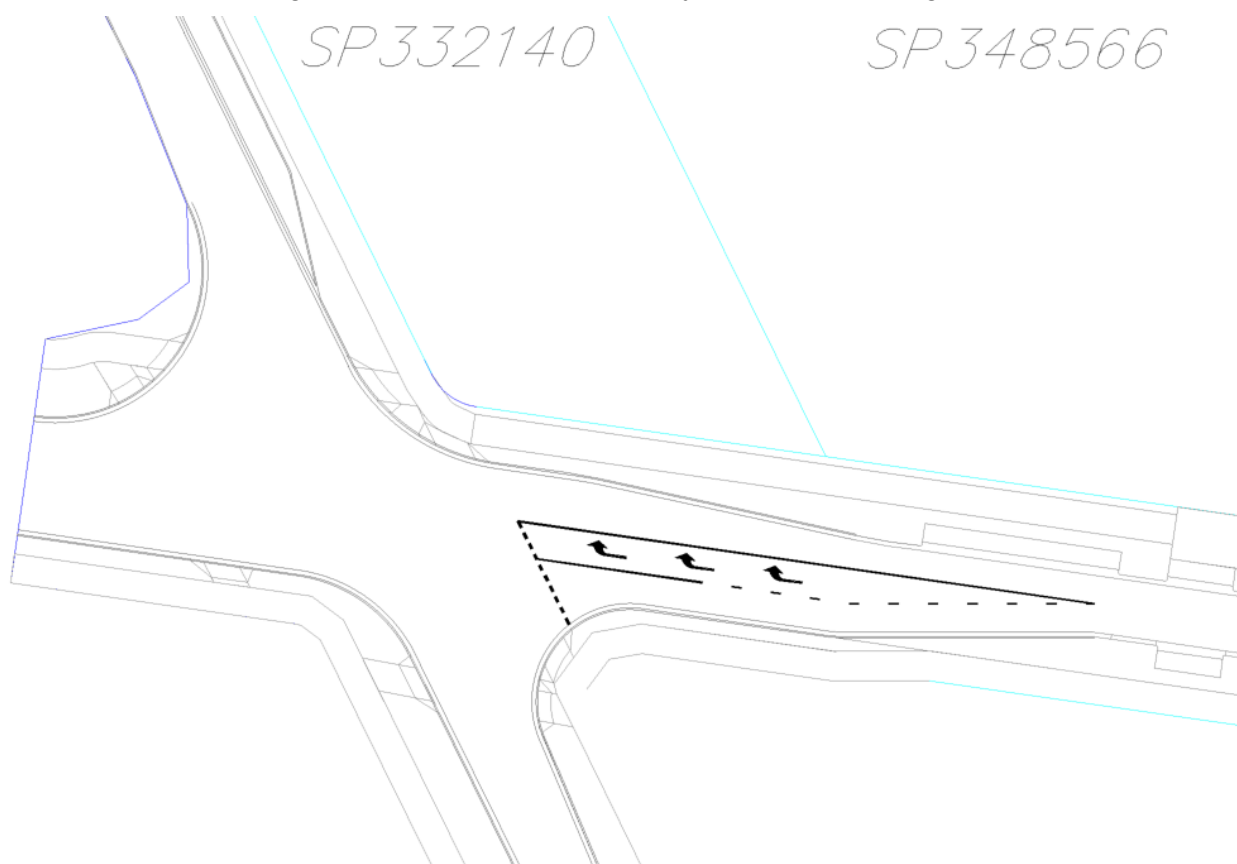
Parkland Drive / Centre Access Street interim intersection layout
